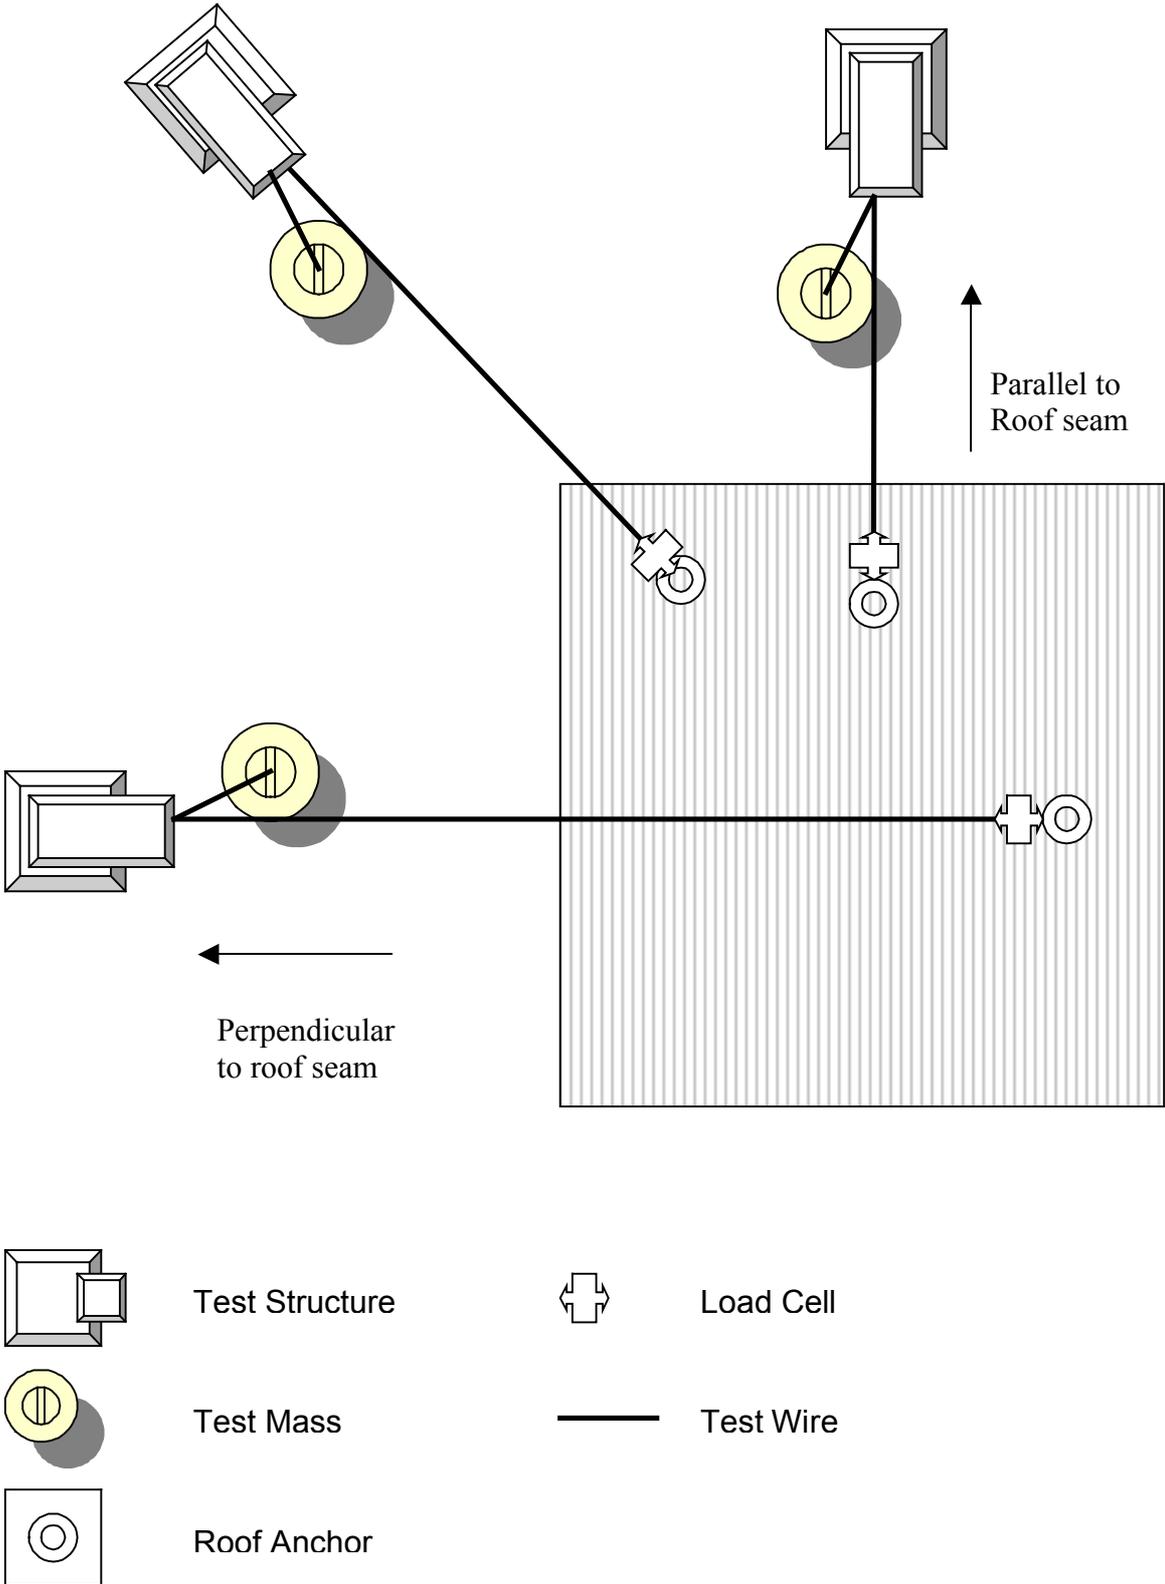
TYPICAL DYNAMIC TEST SET UP - PLAN VIEW
